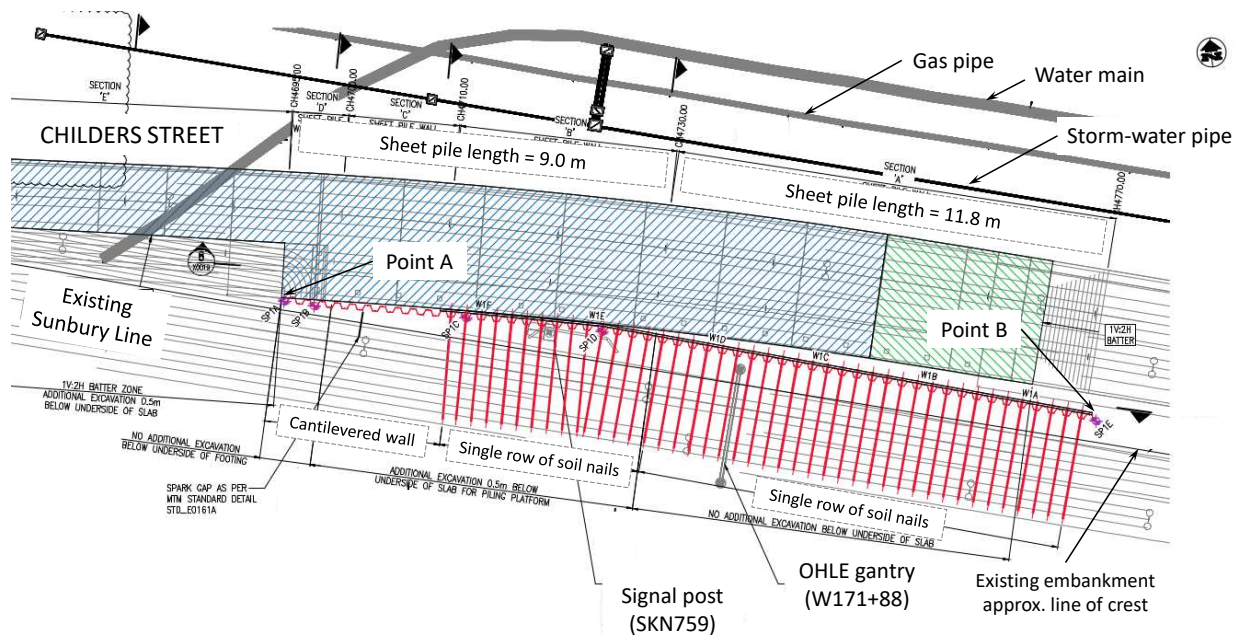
Plan view showing locations of the proposed temporary retaining walls.
